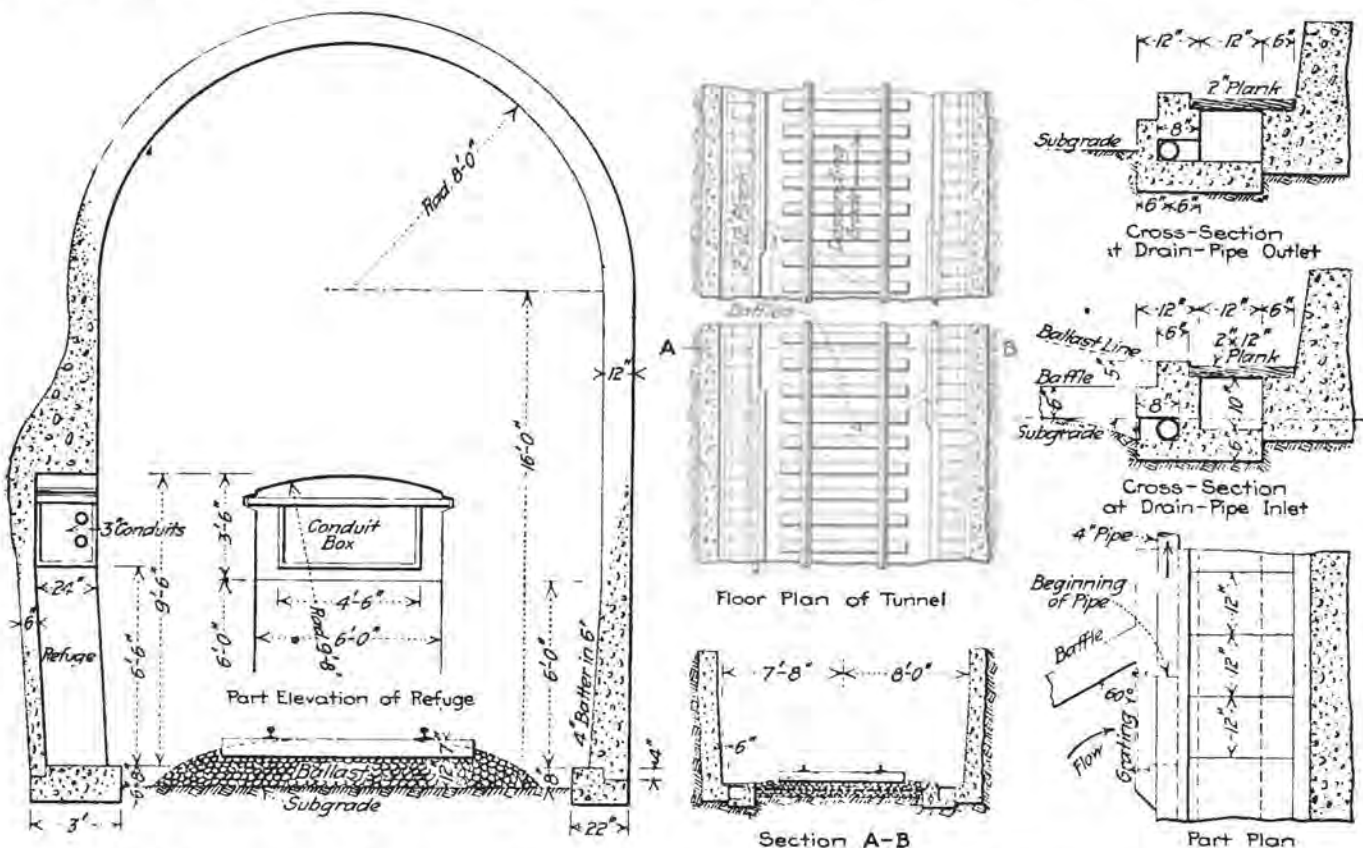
TYPICAL CROSS-SECTION OF SNOQUALMIE TUNNEL, WITH DETAILS OF REFUGE CHAMBERS AND CONCRETE GUTTERS
